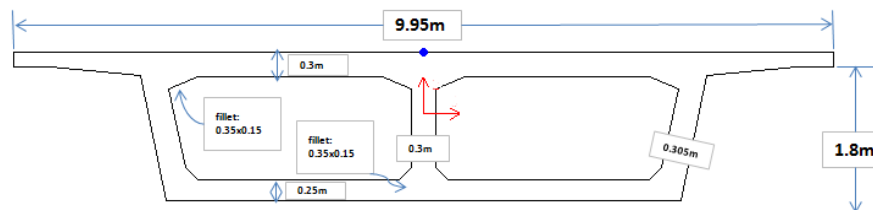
the longitudinal cross-section of the 97.758m three-span continuous box-girder
